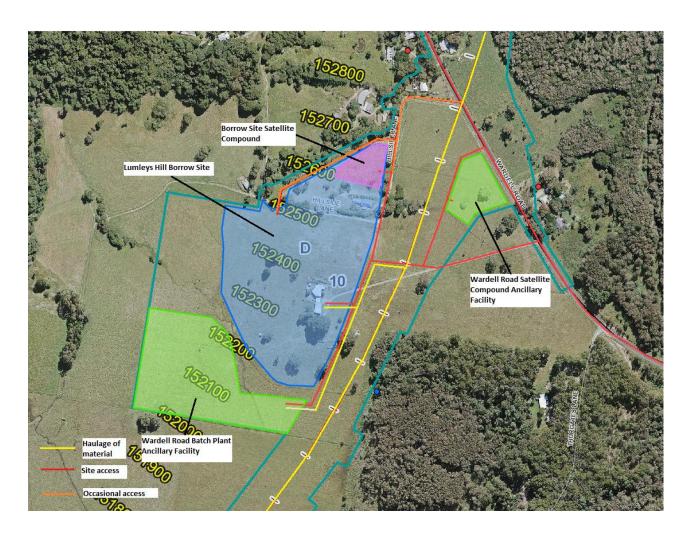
Layout and extent of the proposed Lumleys Hill Borrow Site
